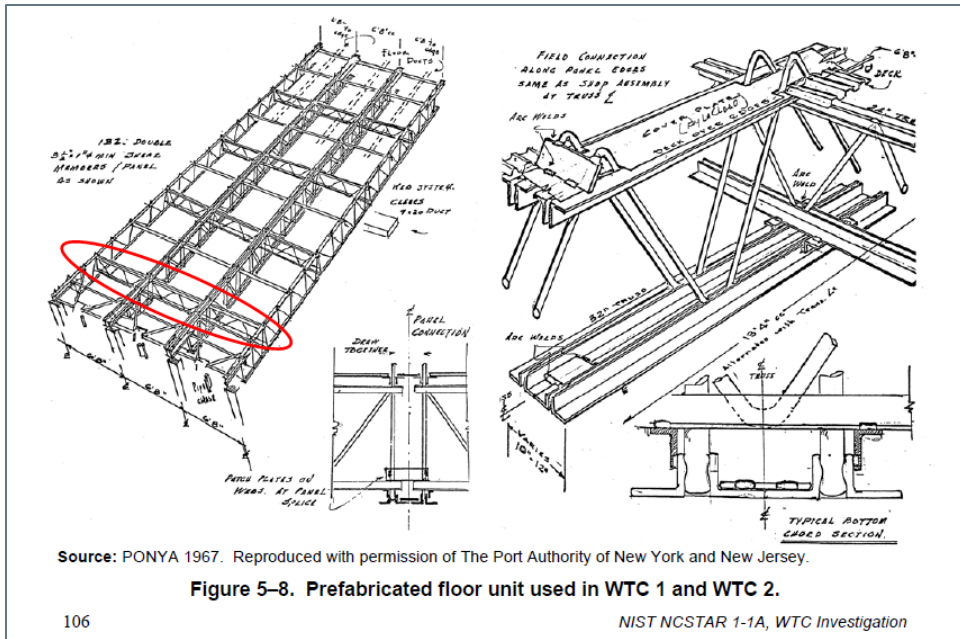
Floor truss assembly showing cross-bracing (red oval) that would have provided a significant cross-section for the propellant to impact as it traversed across the office area.
